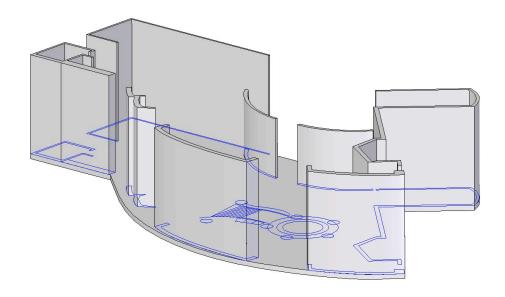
3D Simplified Floor Plan of The 1st Floor
